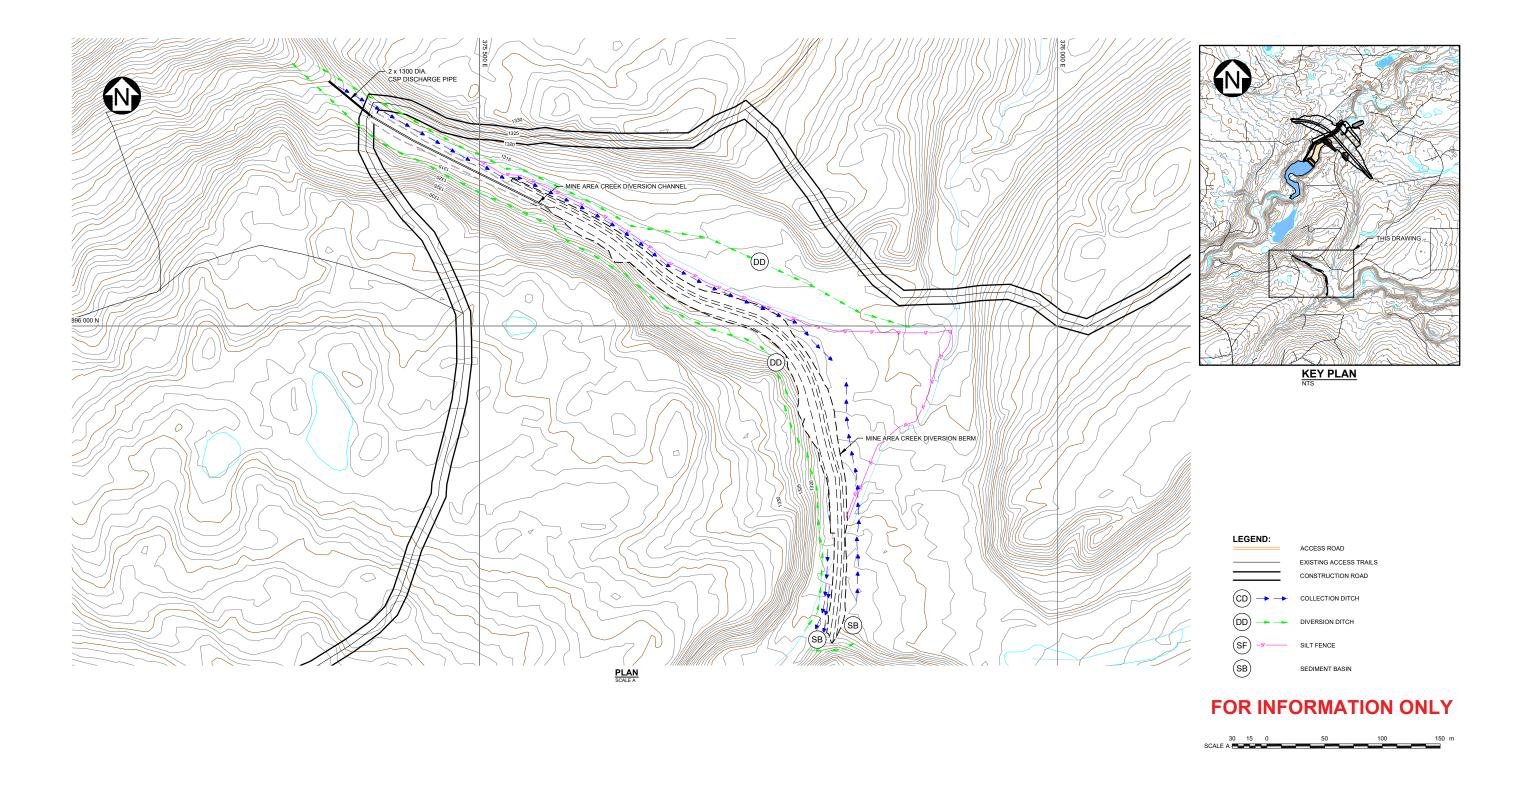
Tailings Storage Facility Mine Area Creek Diversion – Erosion and Sediment Control Plan
